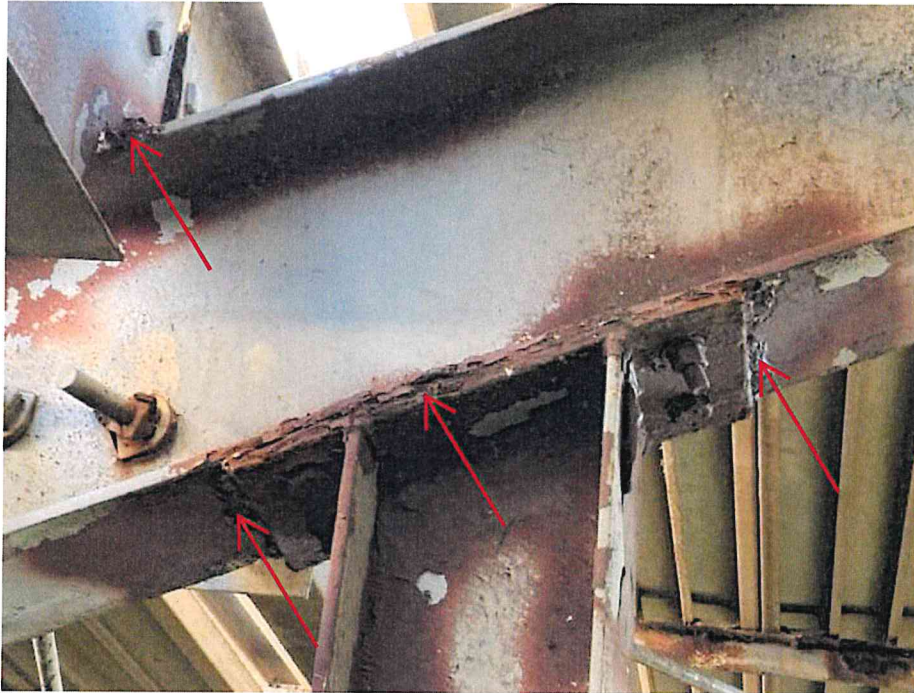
Photo showing severe corrosion at column web & flange, column top plate, and steel beam flange (indicated by red arrows)
